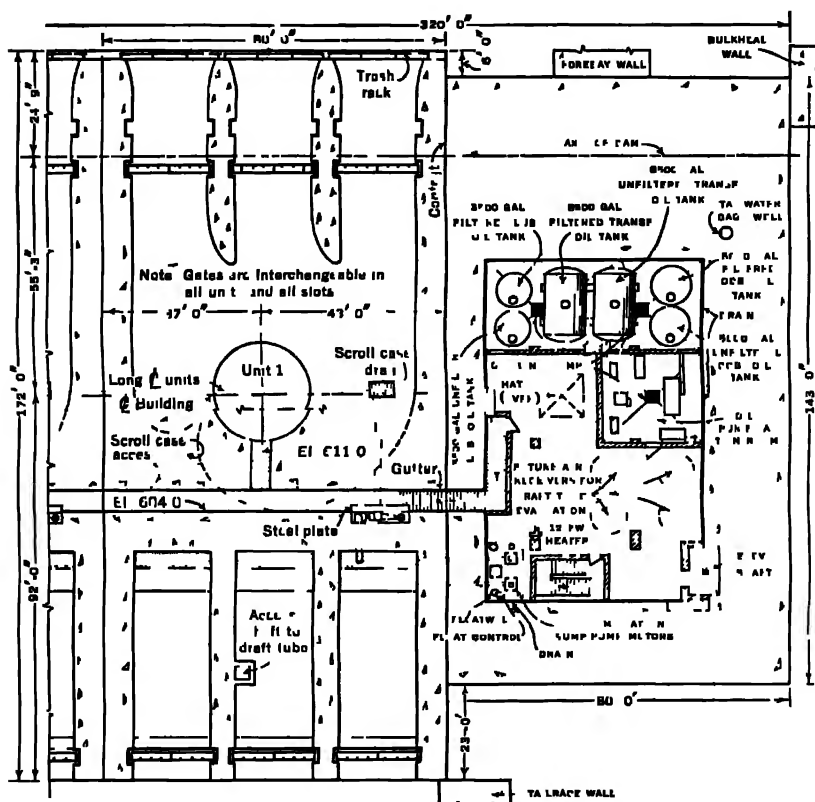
Horizontal section through Chuckawalla power plant, Tennessee River, Tennessee Valley Authority. Plan of Unit 1 shown. Units 2 and 3 similar (see also Fig. 4).
